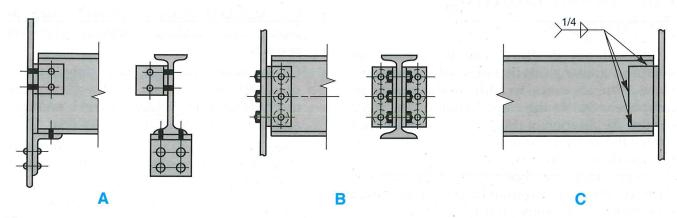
Methods of illustrating steel beam connections. A—Rivets. B—Bolts. C—Welds.
